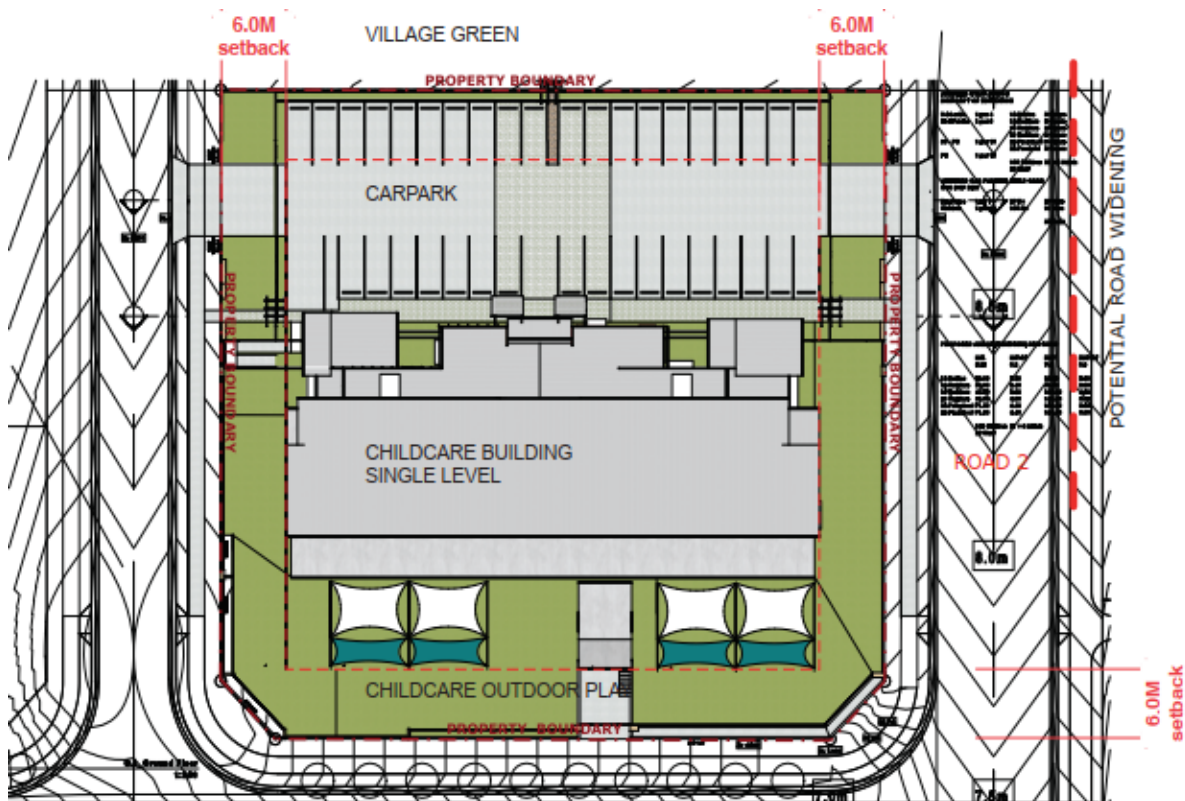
Proposed Childcare Site Plan (Source: Rust Architecture Design)
